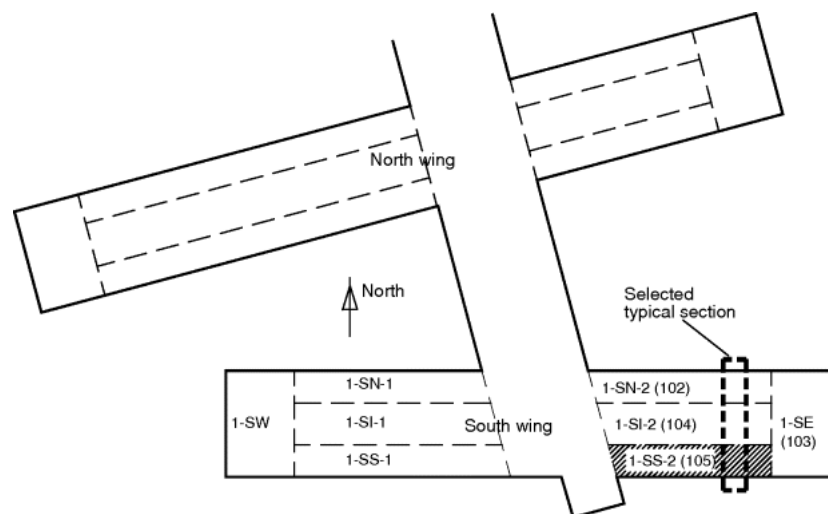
Schematic floor plan showing thermal zones of the first floor (“1-SI-2” represents first floor, south wing, interior thermal zone, and east bay of the RSF building)
